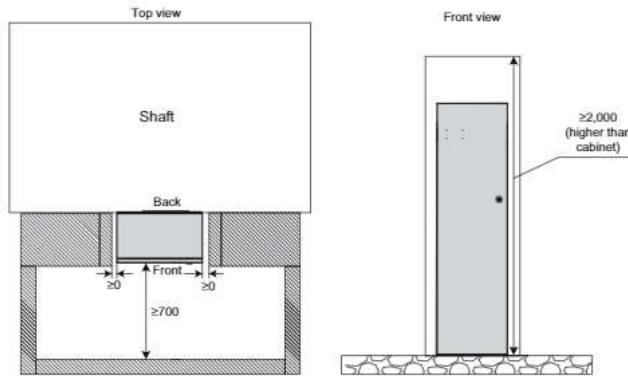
Installation clearance for machine-roomless control cabinet (in mm)
